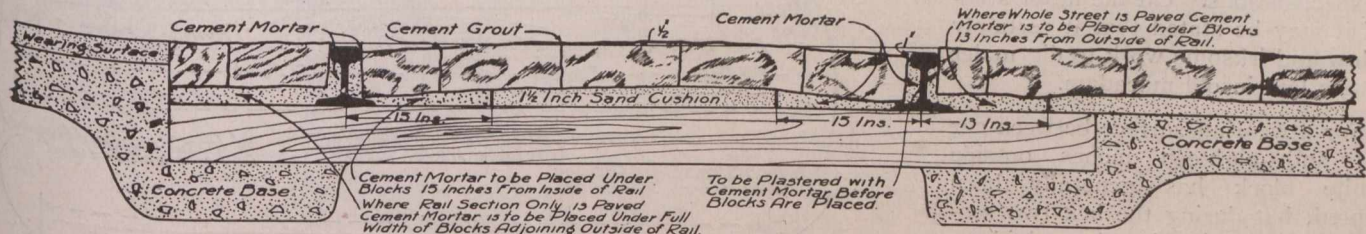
Detail of Rail Section for Granite Block Pavement.
